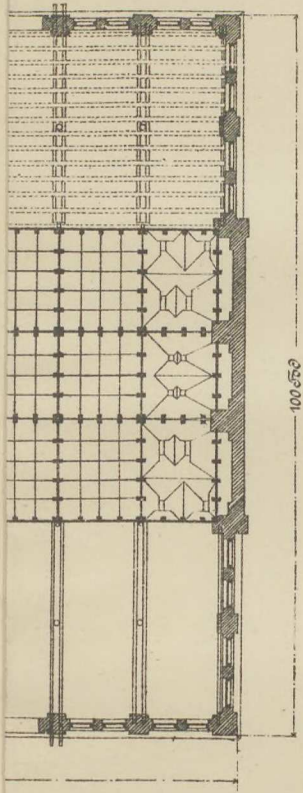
PLATE III. LATITUDINAL SECTIONS OF SILO WAREHOUSE,
